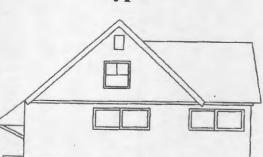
Levittown Ranch Twinbrook Section 1 (M: 26-25)
